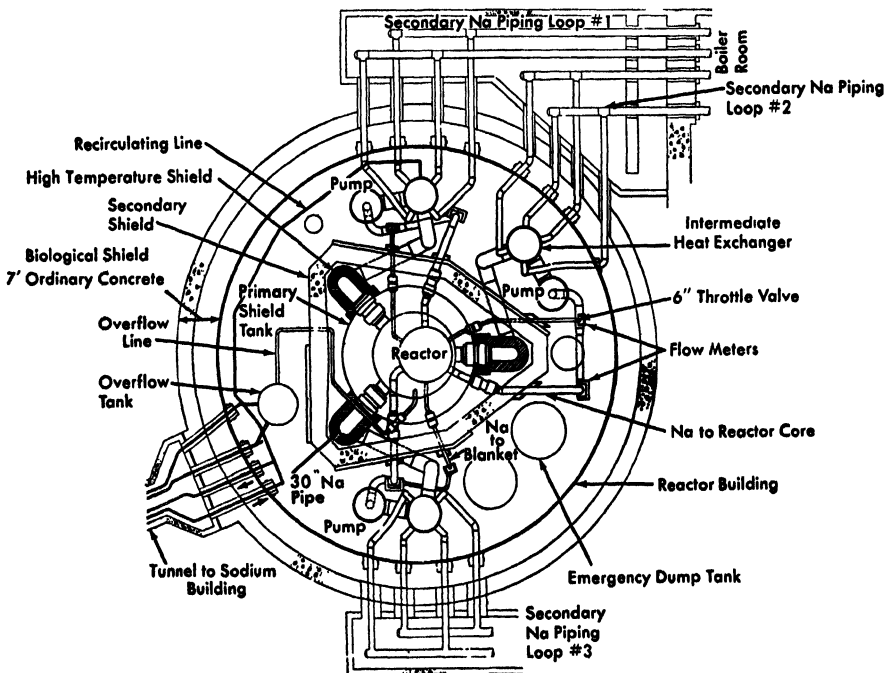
Plan view of the Enrico Fermi Reactor building, below the operating floor.
